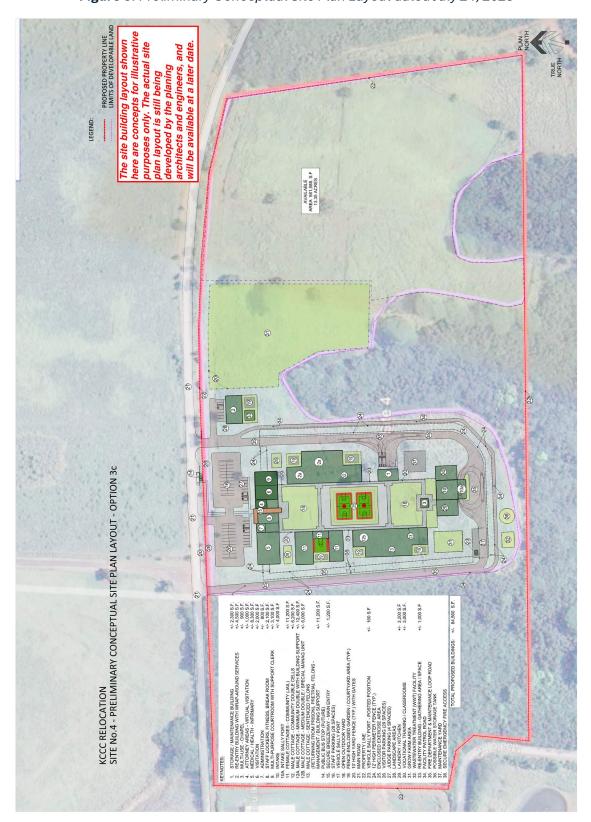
Preliminary Conceptual Site Plan Layout dated July 24, 2025
